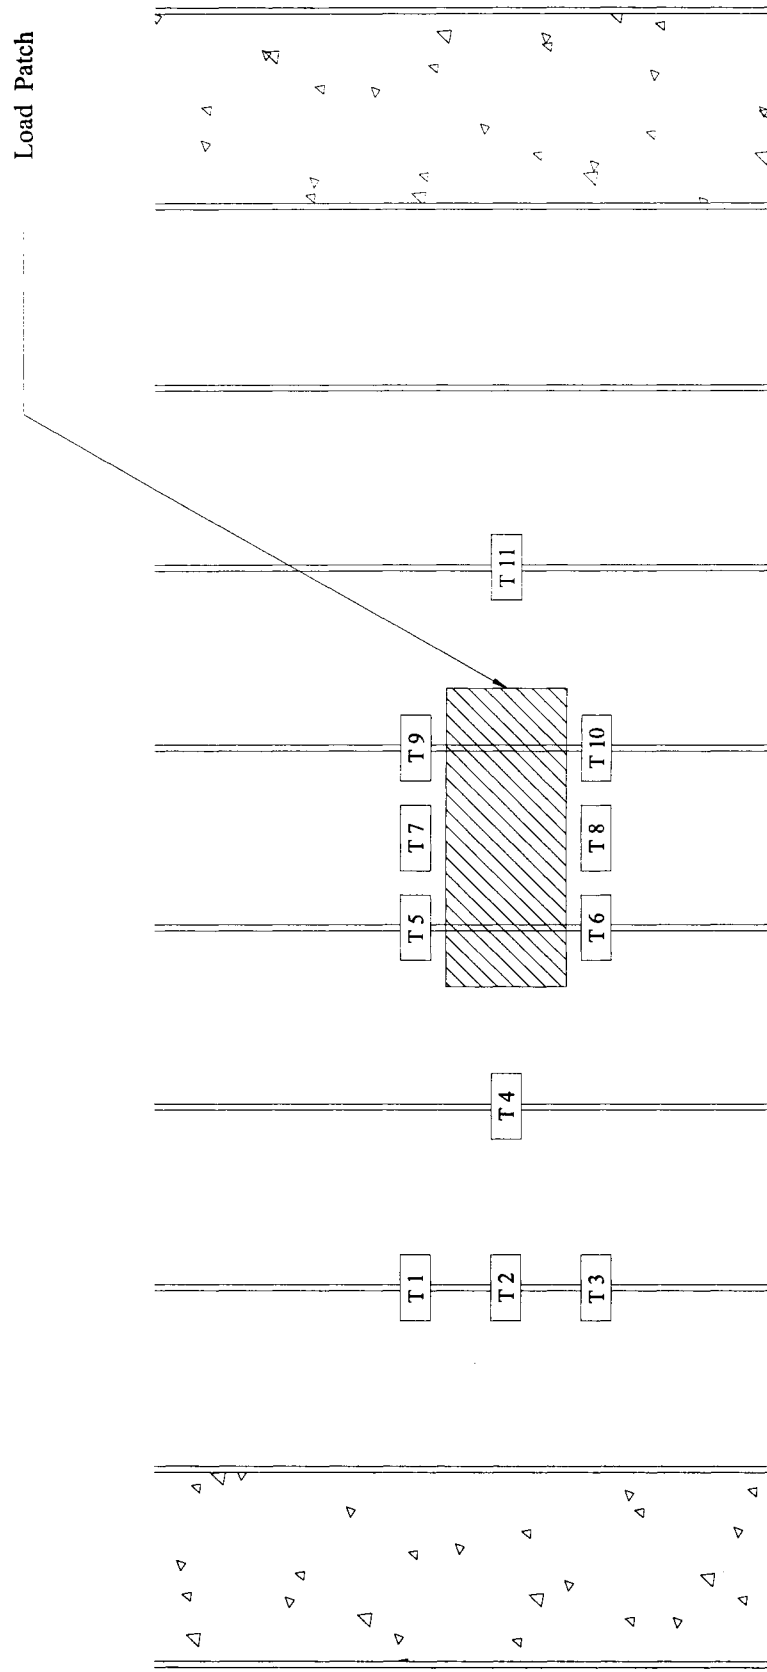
Failure Side A Gage Layout, Top of Side A
